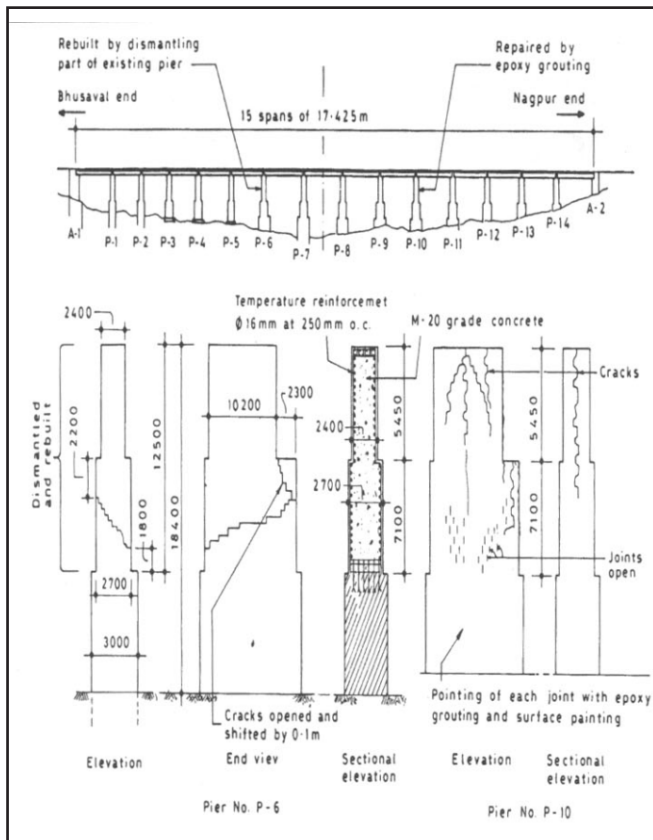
General elevation and cross-section of a railway bridge (Case study No. 1)
